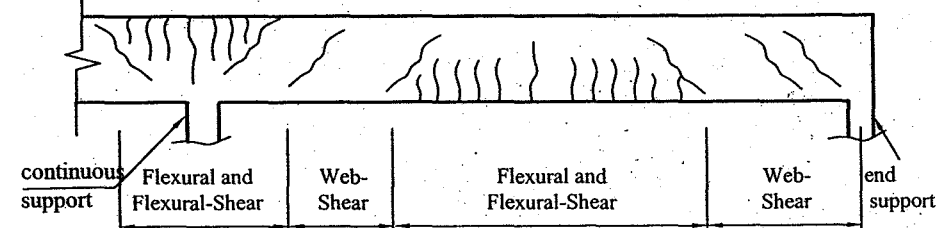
Types of cracking in reinforced concrete beams
